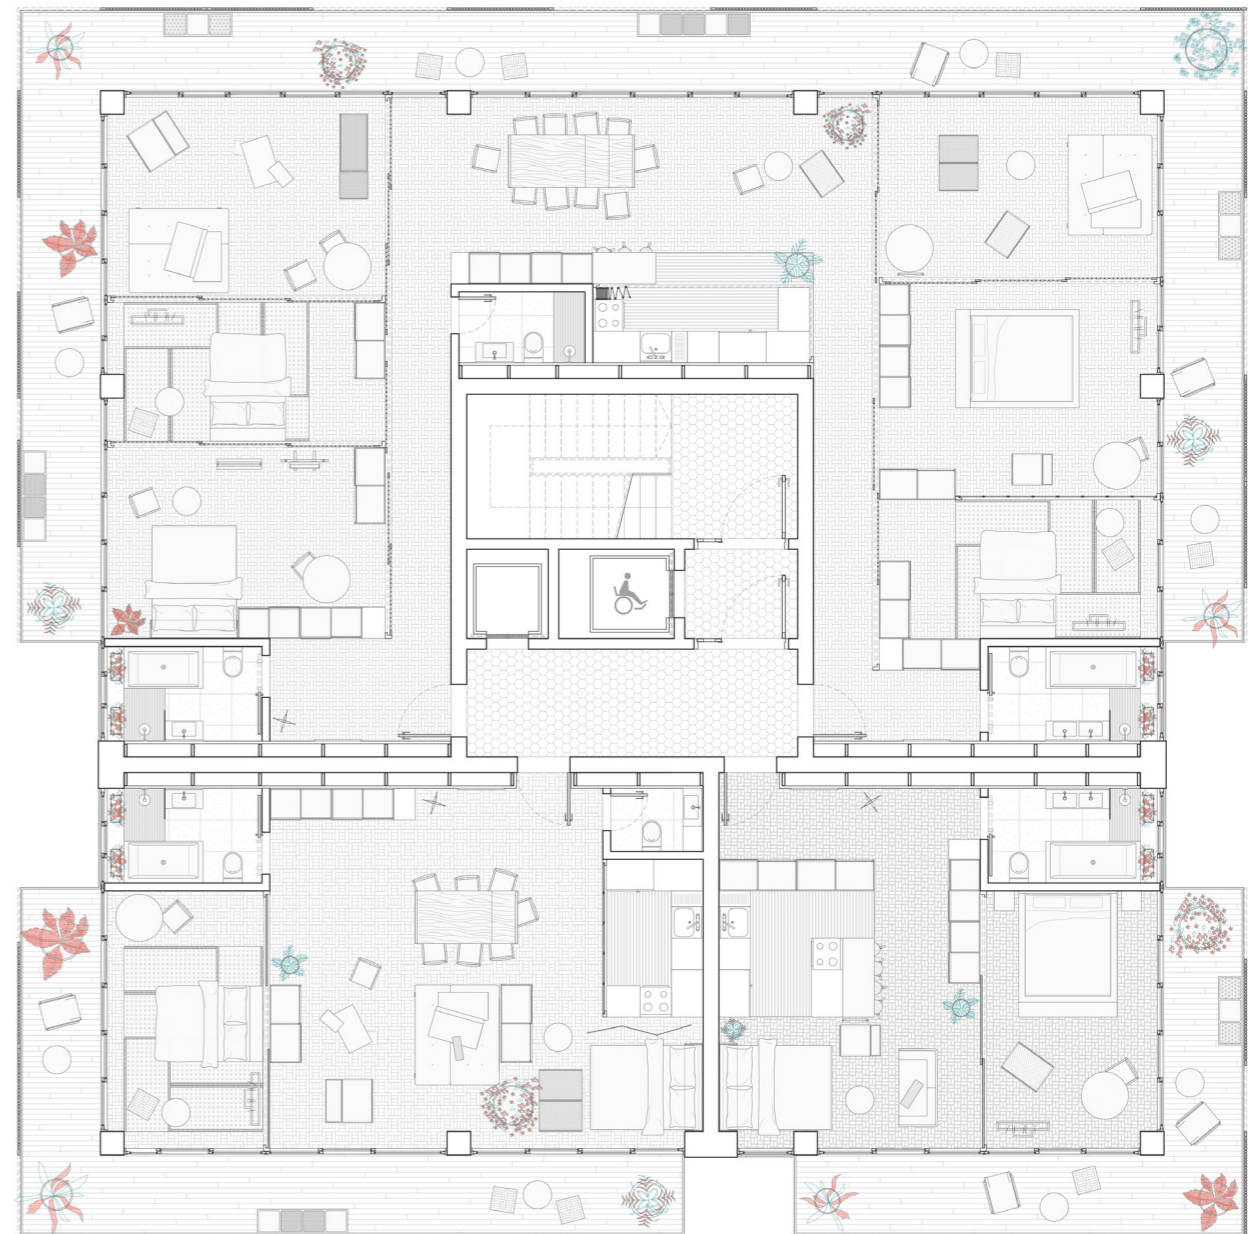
Type 2 - Dwelling Units Floor Plan, variation 2 (levels 9-10)
